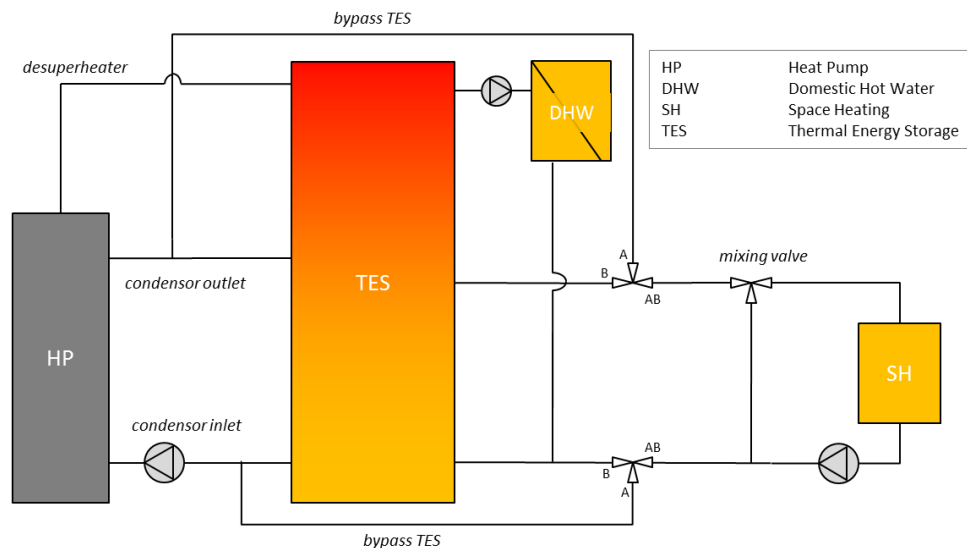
Hydraulic concept of the heat pump system and connection to TES and building.
